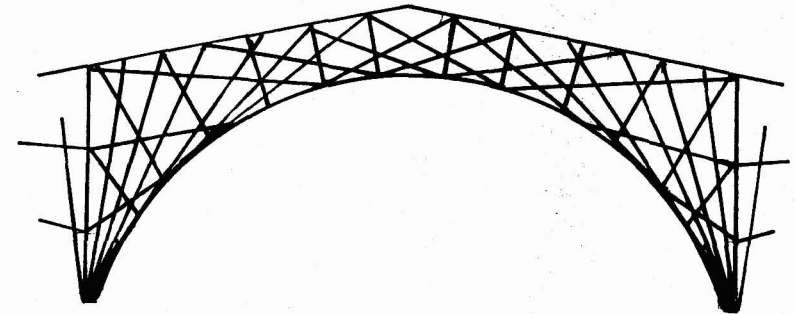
Old Walton Bridge on the River Thames: the central of three arches (deck not shown).
